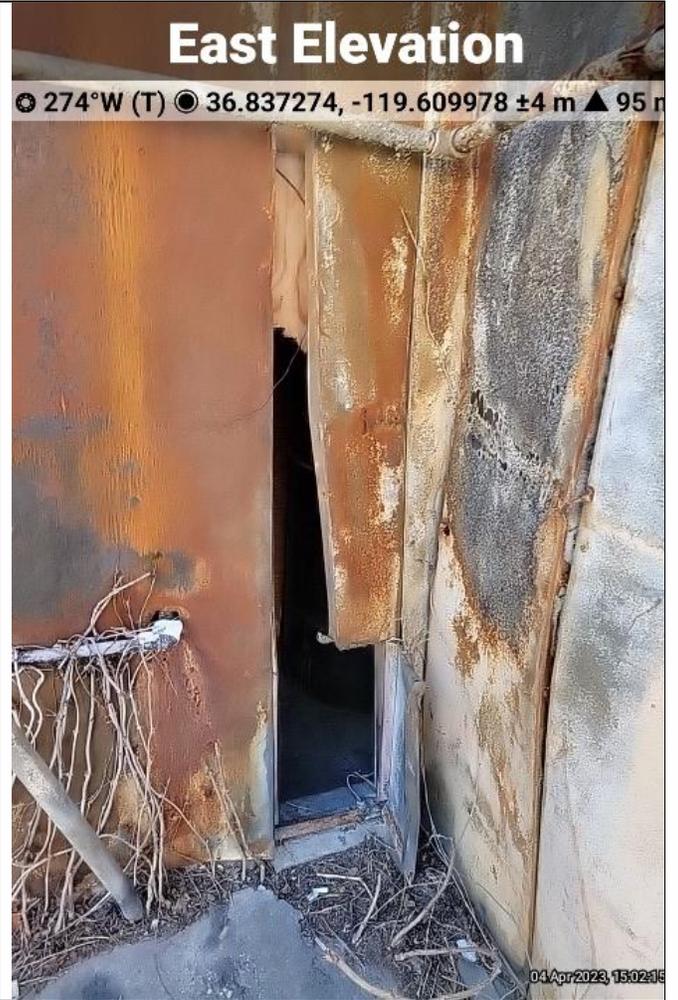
Hole present in steel wall of building at rear allows trespasser entry. View west.
